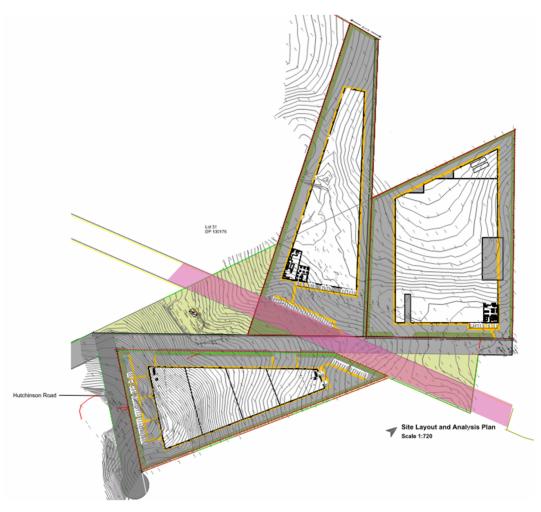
Proposed development site plan (Jackson Environment and Planning)
